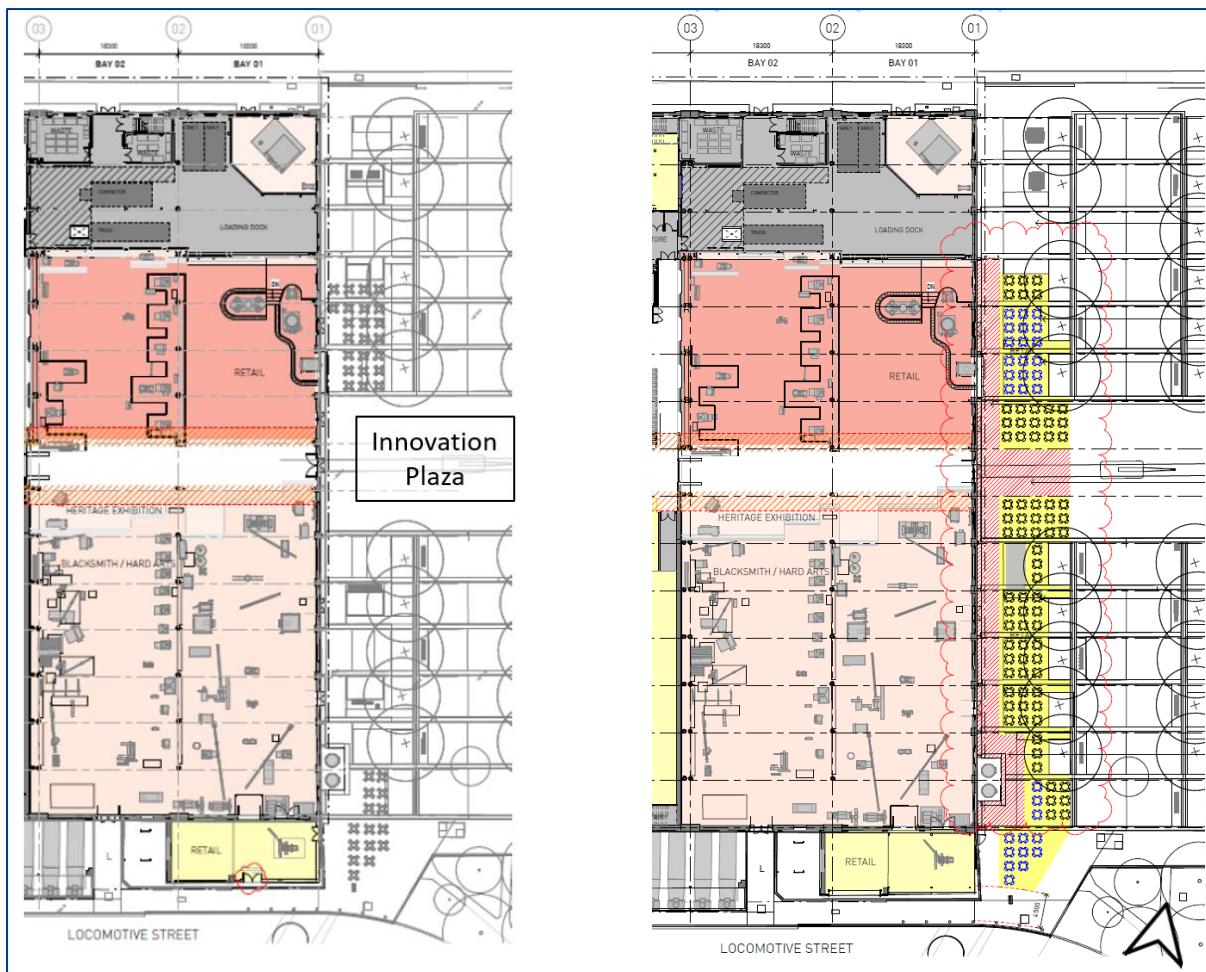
| Approved (left) and proposed (right) ground floor plan, showing proposed expansion of retail areas into Innovation Plaza (Source: Modification Report and RtS)
